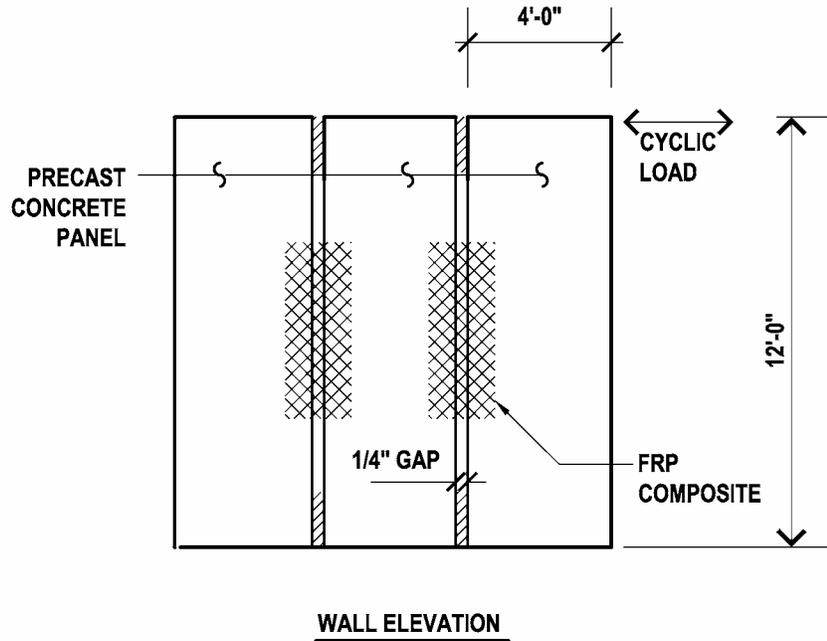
Panel Setup for Testing of FRP Panel-to-Panel Connections
